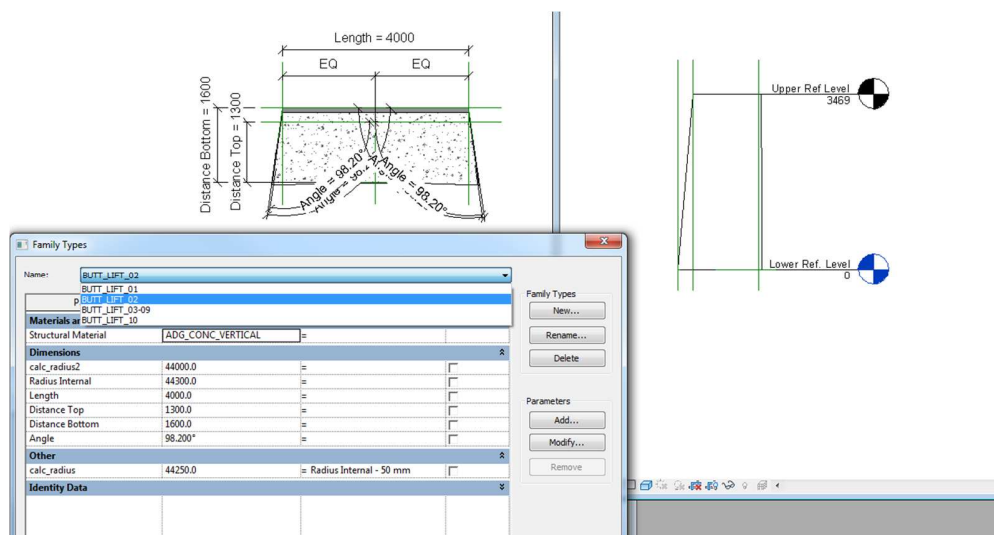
STRUCTURAL COLUMN REVIT SETUP
